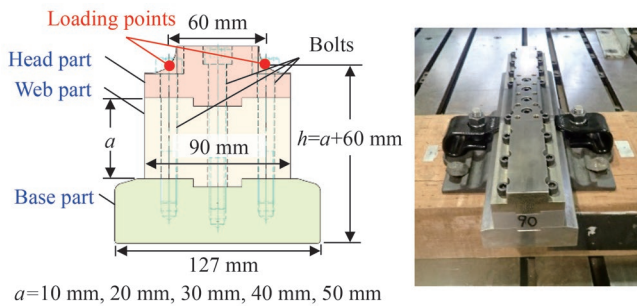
Test rail for rail fastening systems of rail joints (50 kgN rails)
